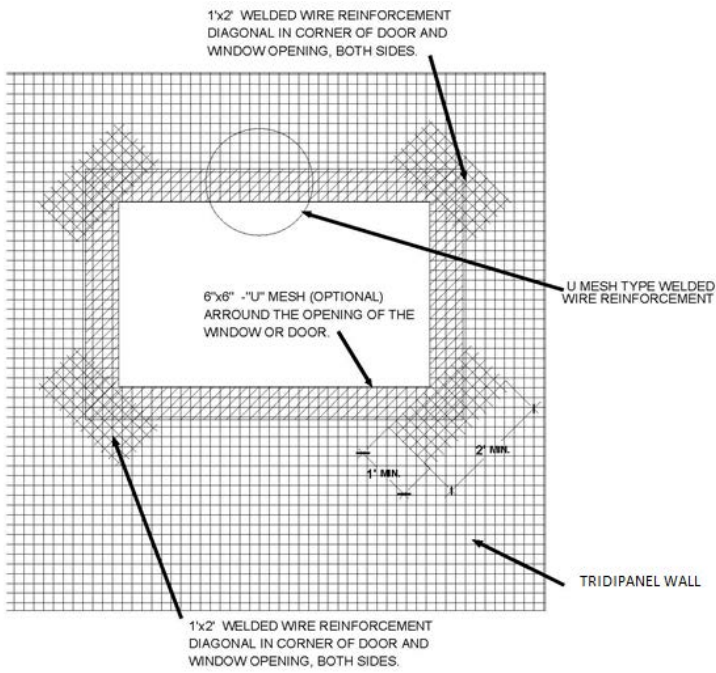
DETAIL, REINFORCEMENT IN DOOR AND WINDOW CORNERS
